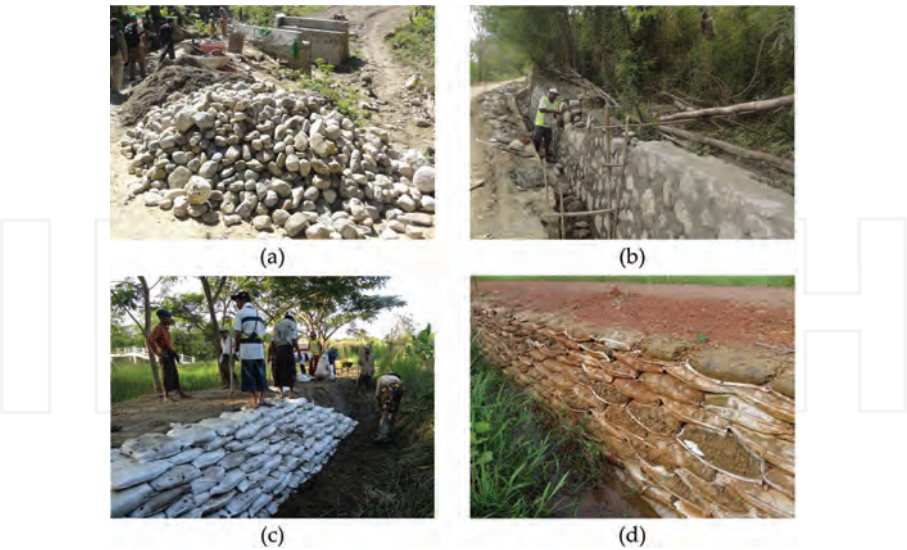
Construction of retaining wall: (a) Material for retaining wall with masonry; (b) construction of retaining wall by masonry; (c) construction of retaining wall with Do-nou; (d) torn bags and cemented material inside bags.
